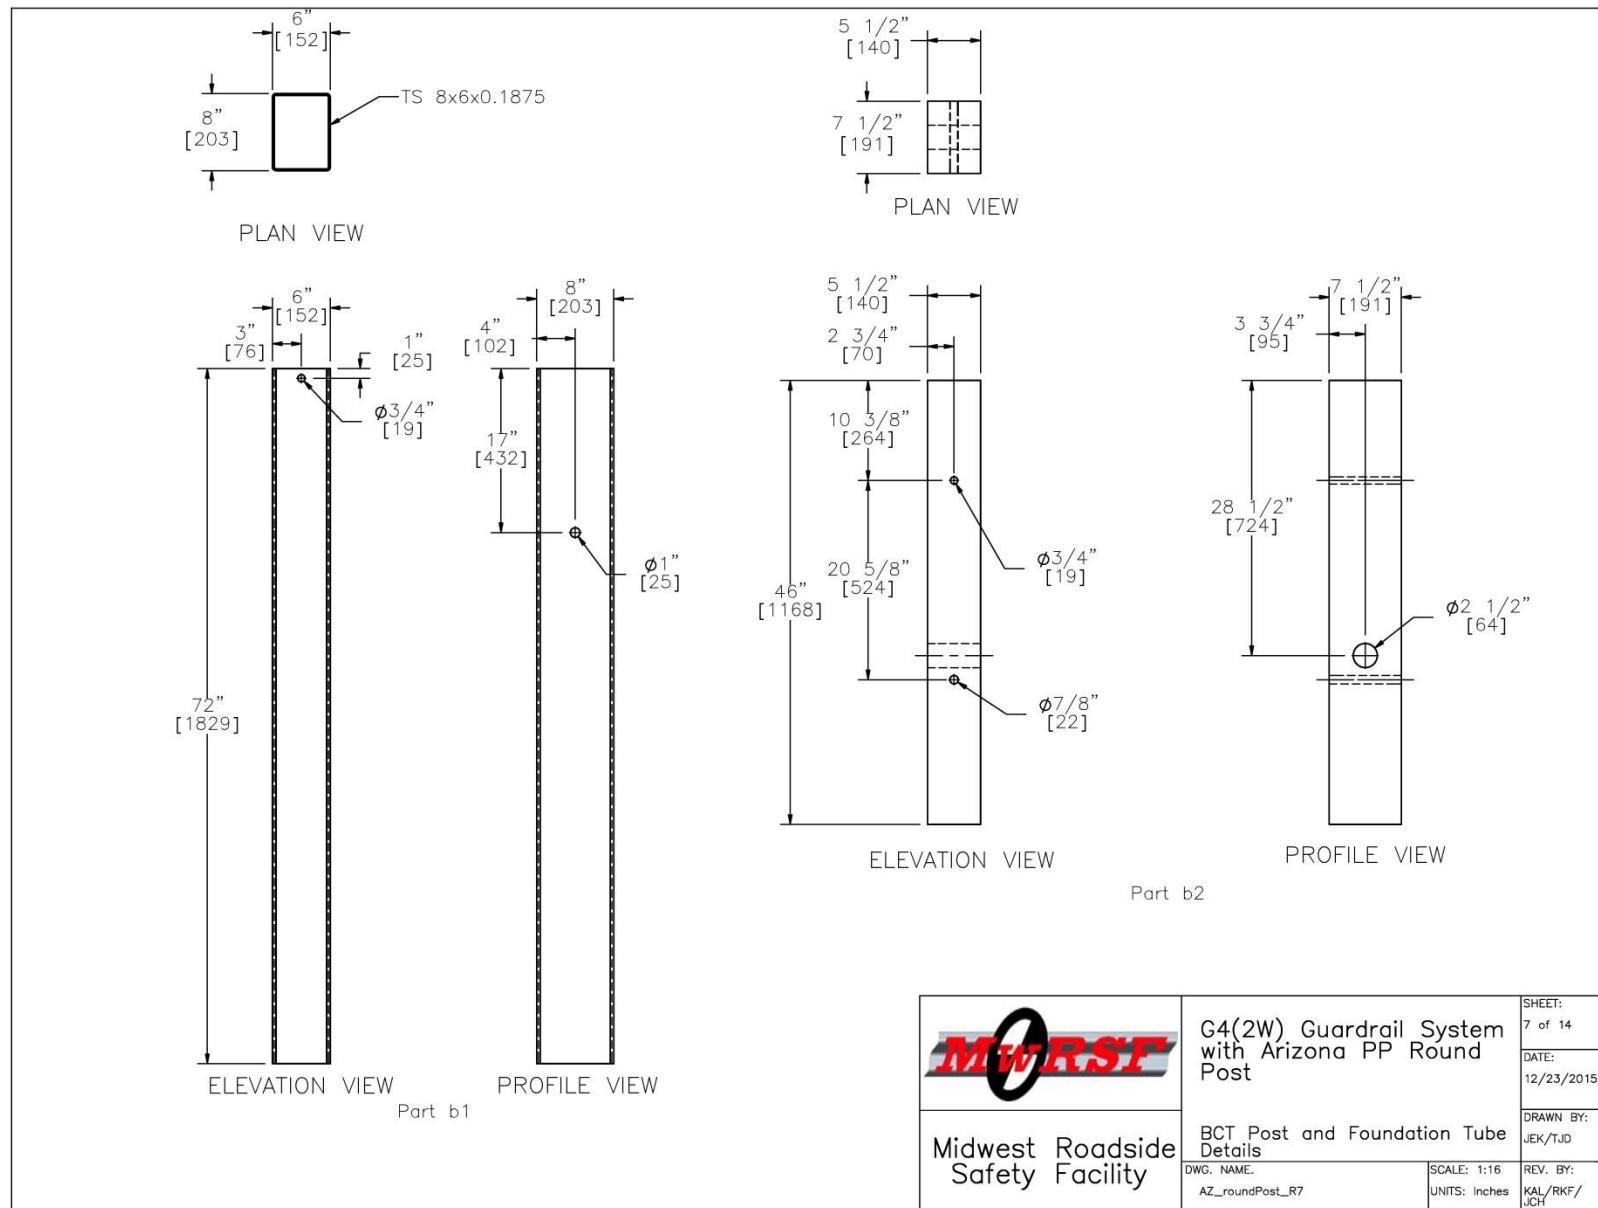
BCT Post and Foundation Tube Details, Test No. AZRP-1
